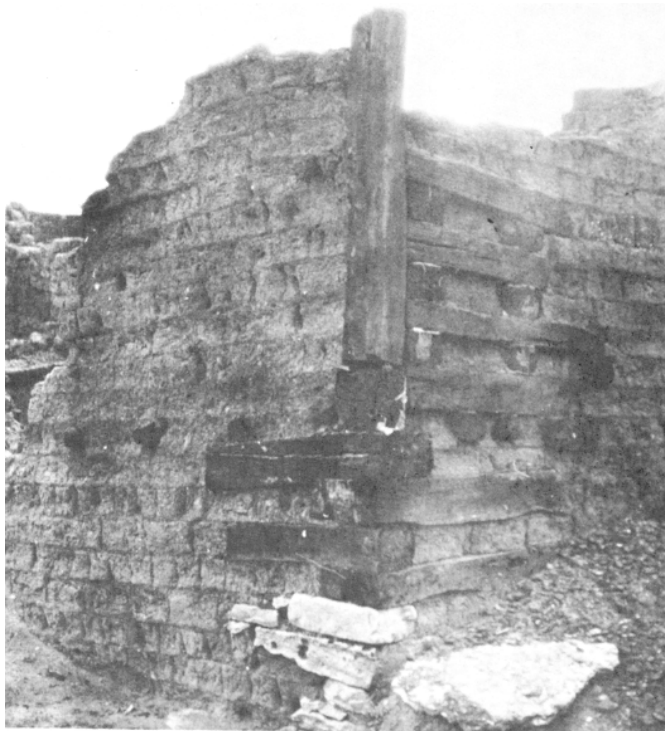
Photograph from the Michigan excavation of the stone and wood corner protection on house C5024.
